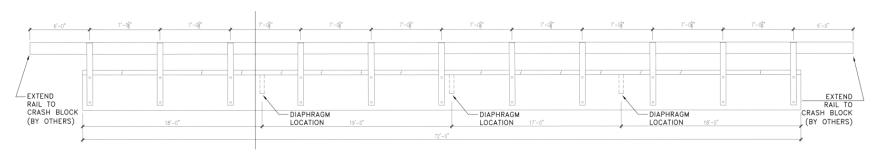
Elevation view of composite timber bridge, page 1/3 in Appendix A
